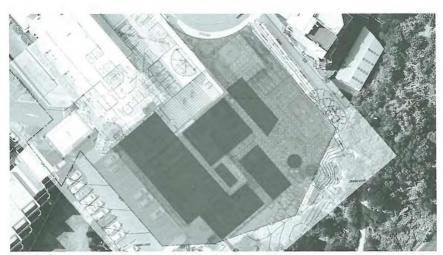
Built form site coverage (source: Myers Planning Group and Nearmap).
